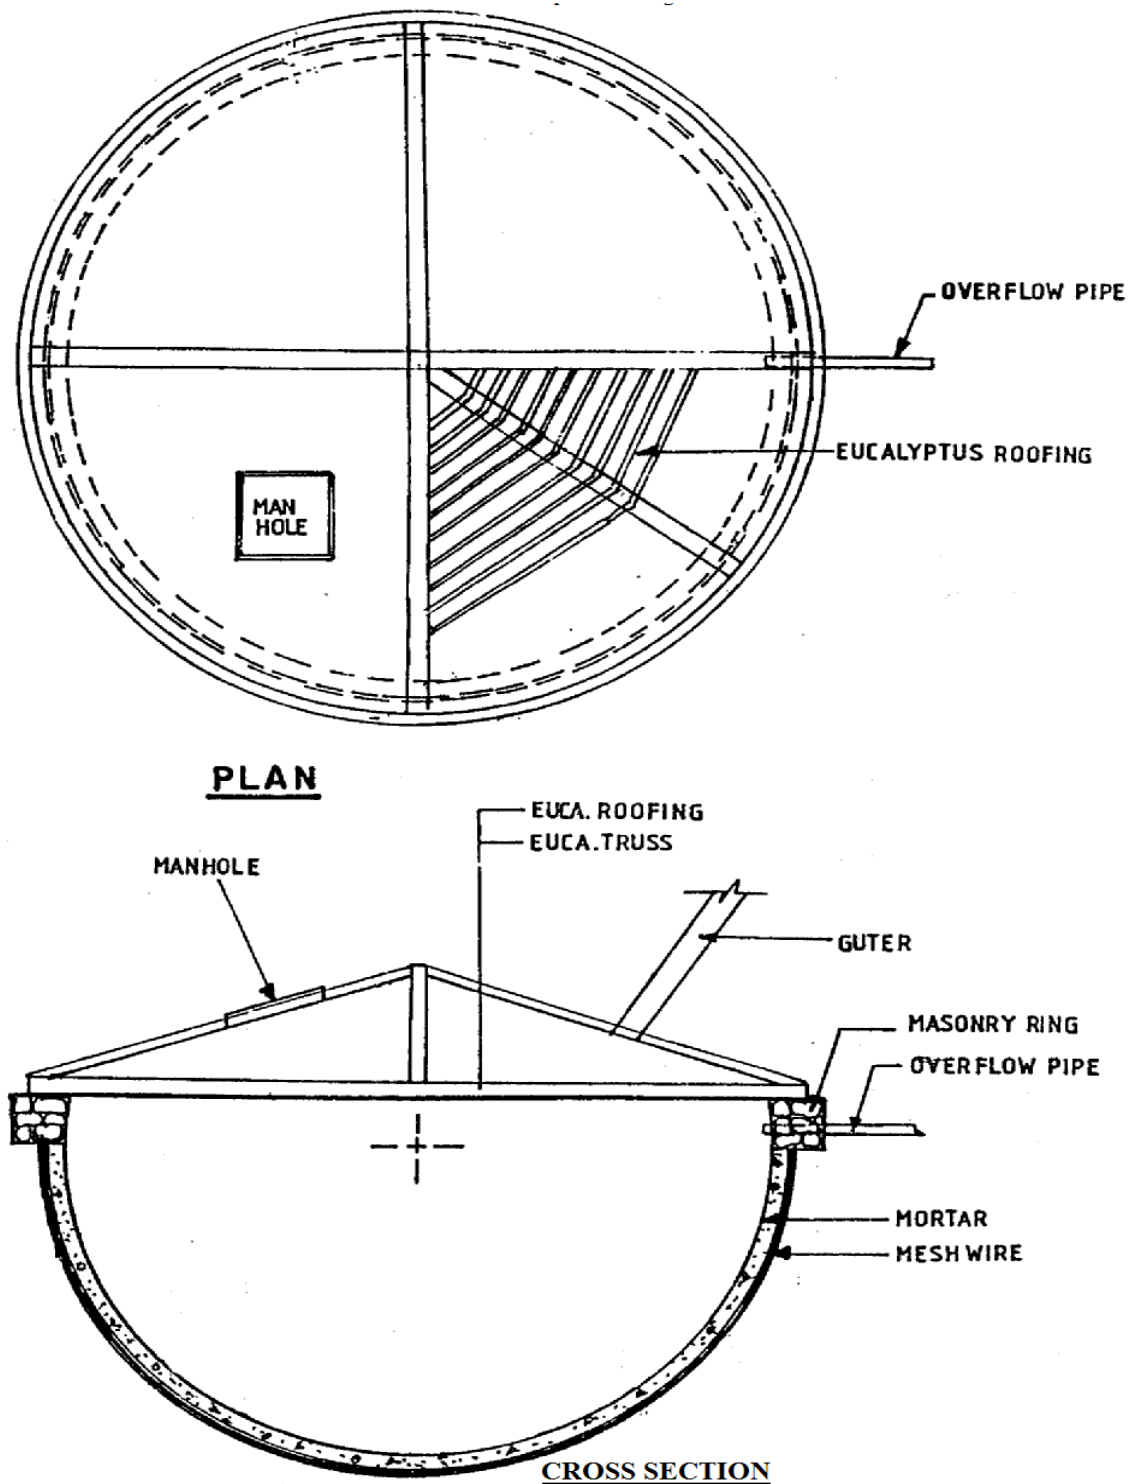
Plan and Cross Sectional View of Hemispherical Storage Tank
